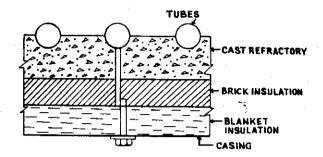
(b) Half-radiant tubes cast in refractory.
